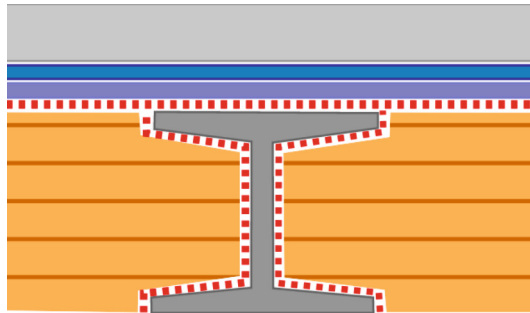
CLT slab with built-up steel beam, potential water entrapment areas indicated by the red dots.
